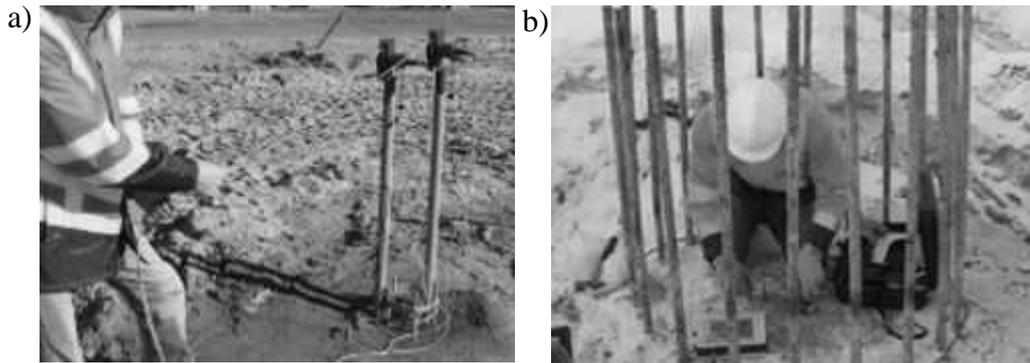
Methods applied to measure the continuity and length of concrete prefabricated piles [1, 2]: a) Cross-hole Sonic Logging, b) Pile Integrity Test (PIT)
